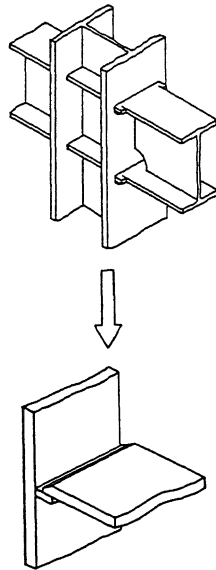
The Way of Modelling the T-shape Specimen from Beam-Column Conjunction
